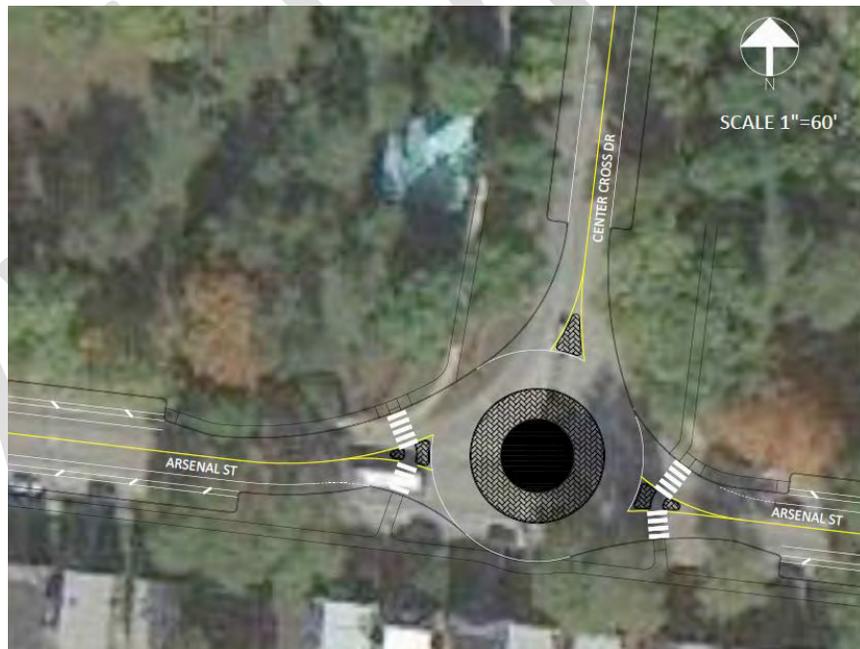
Roundabout Intersection Concept for Arsenal Street at Center Cross Drive
